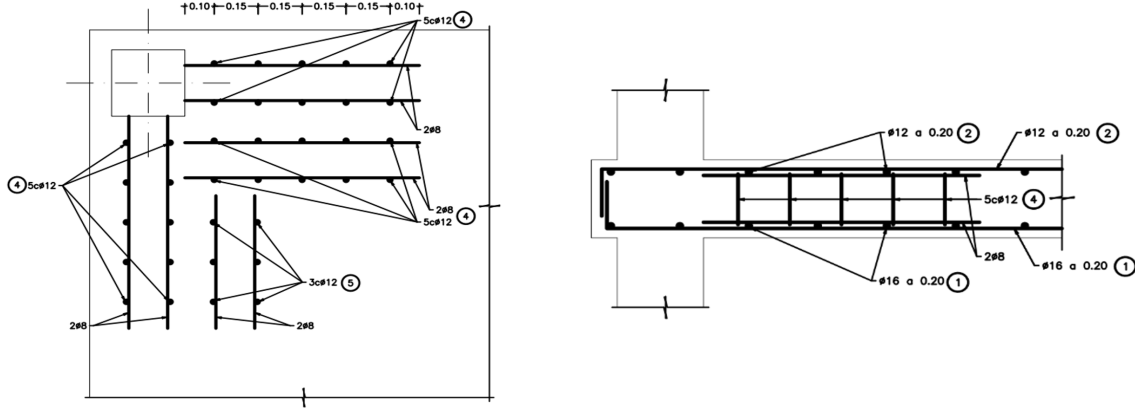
Punching reinforcement (left: plan view; right elevation)
